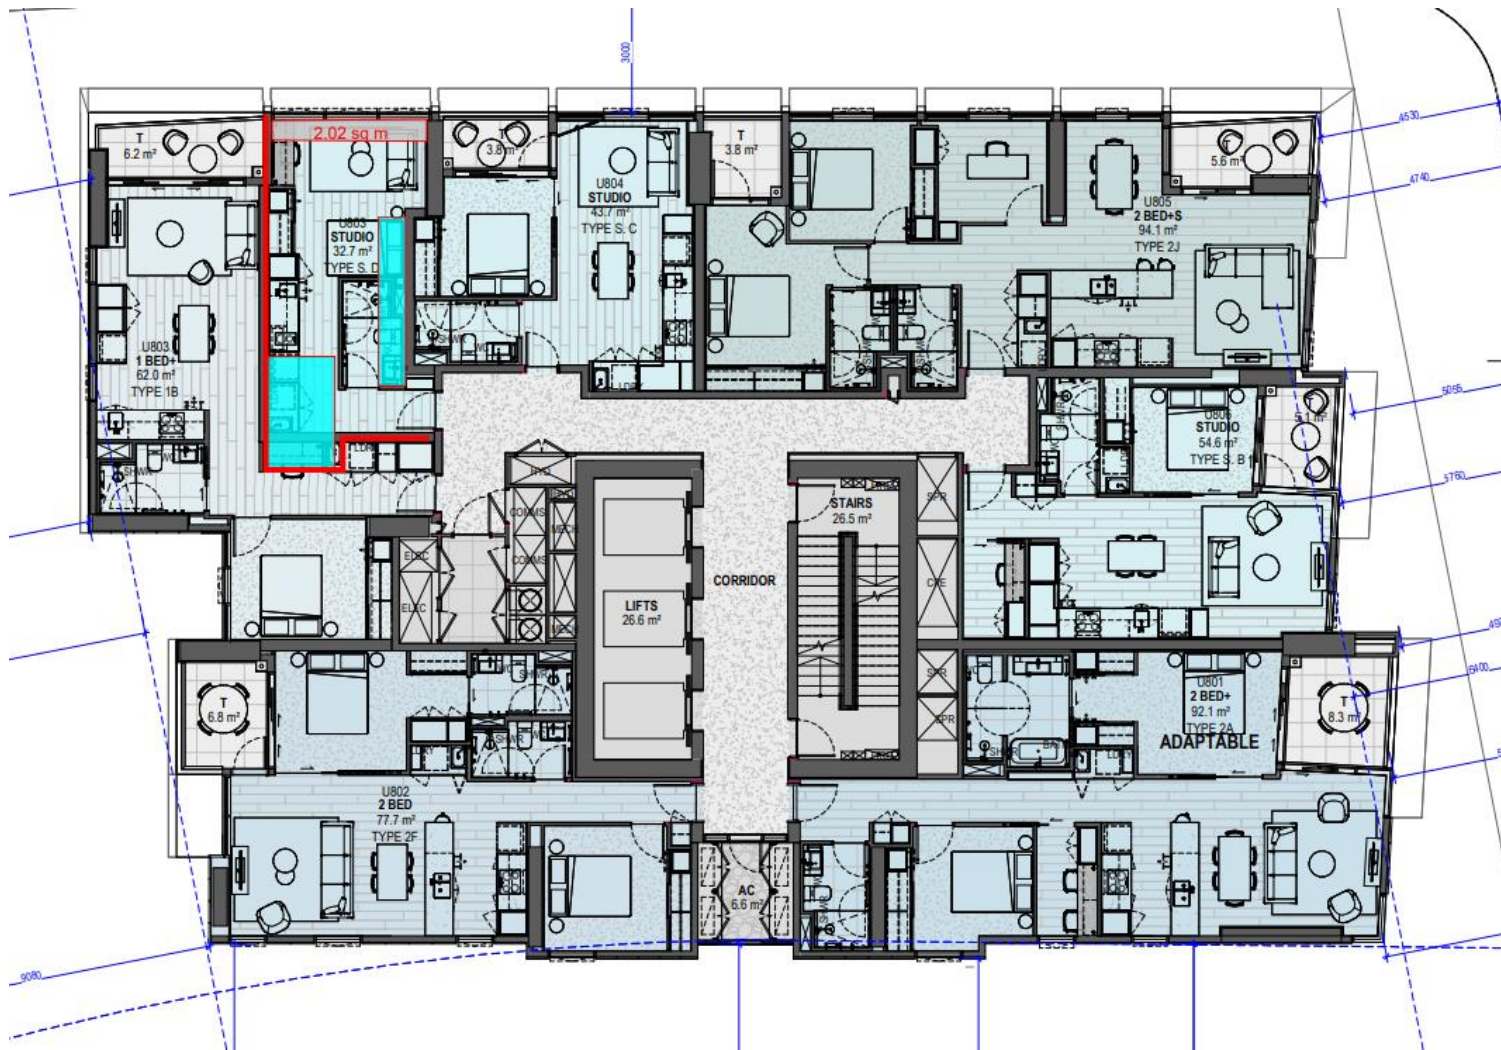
| Indicative amendments to Studio apartment type D to swap the bathroom and kitchen and provide a Juliet balcony. Note this would also require the removal of a study nook in the neighbouring apartment
